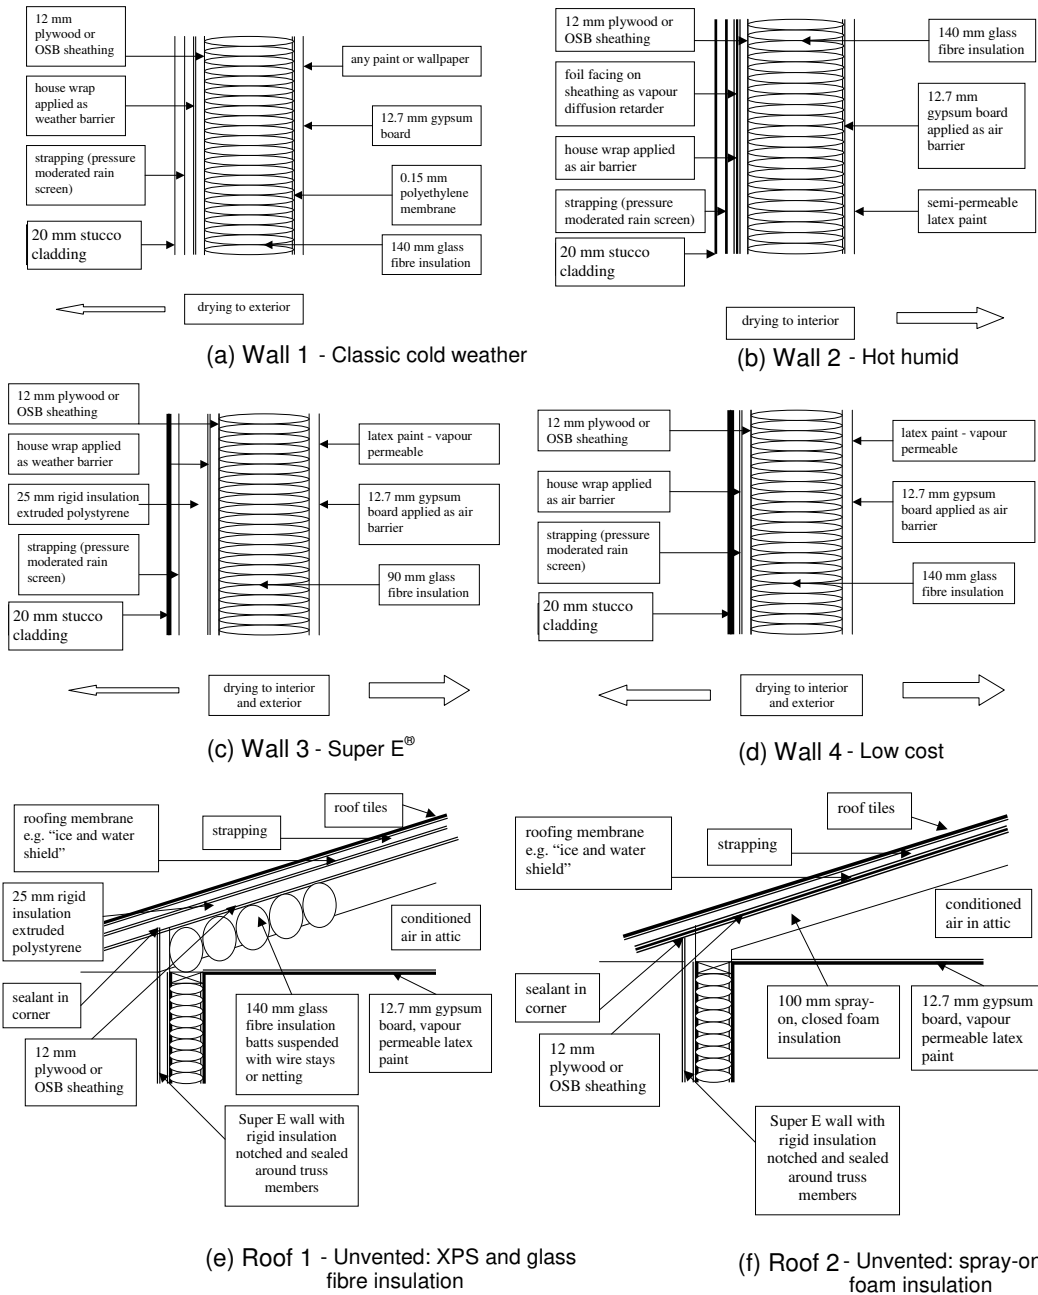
WALLS AND ROOFS CONSTRUCTION DETAILS
